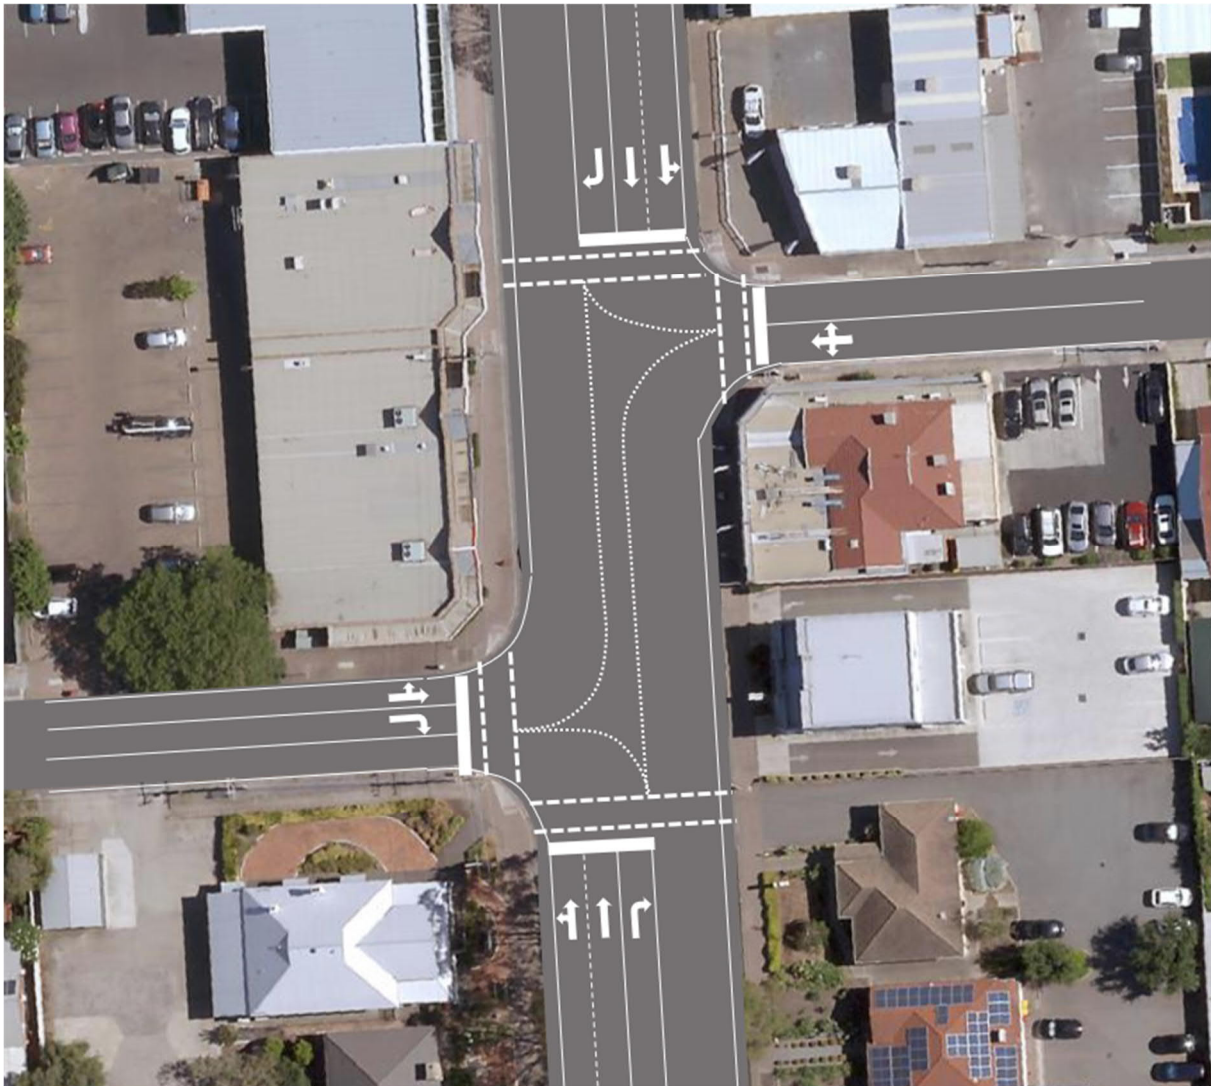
Brighton Road – Wattle Avenue proposed intersection layout
